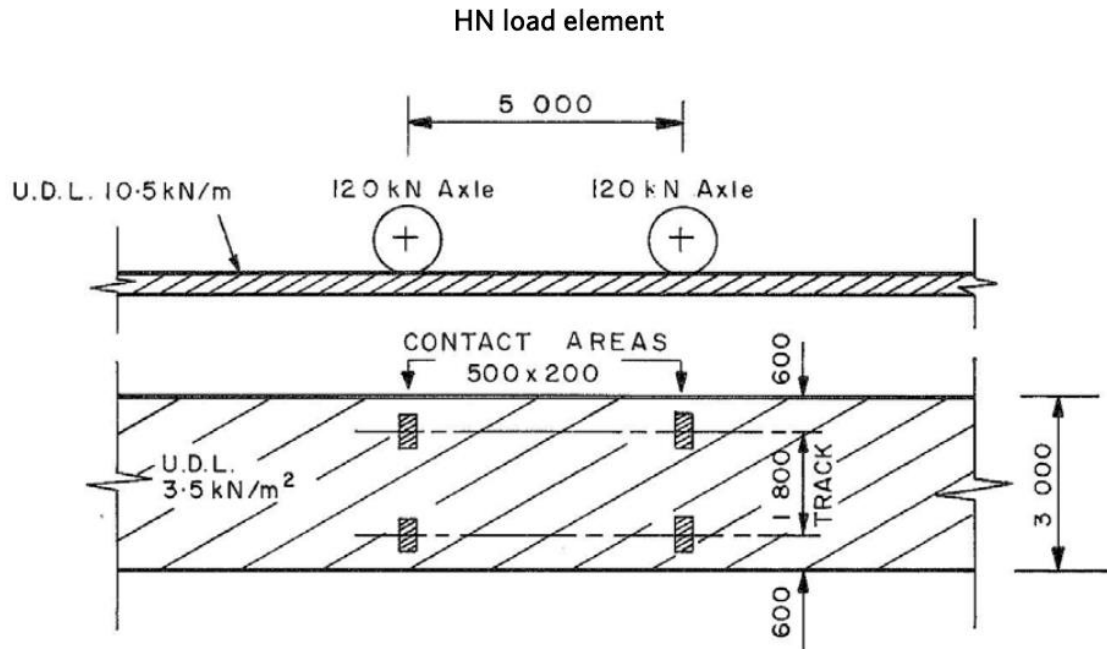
HN load element as described in the NZTA Bridge Manual (2013).
